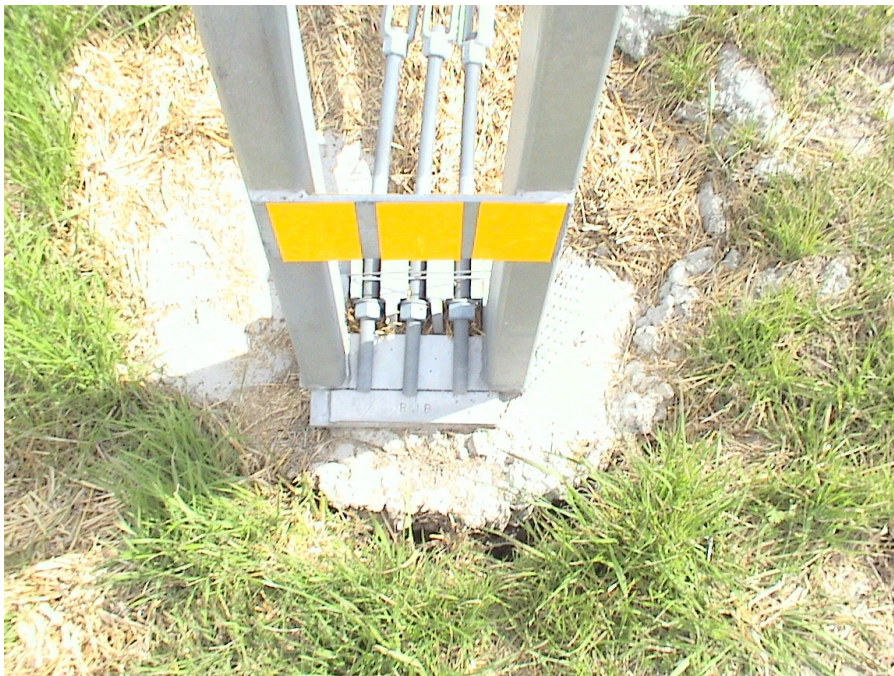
Foundation Failures of 3-cable Median Barriers Built on Expansive Soils at US 80 Eastbound Sta. 476+50
